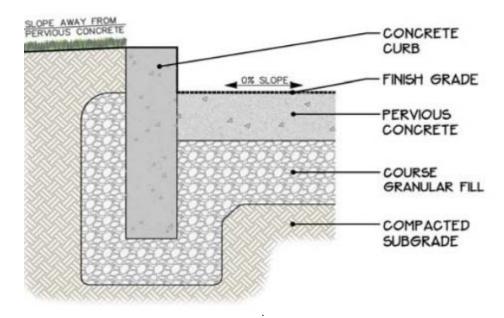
Example Pervious Concrete Cross-section (Source: EPA, 2009)
